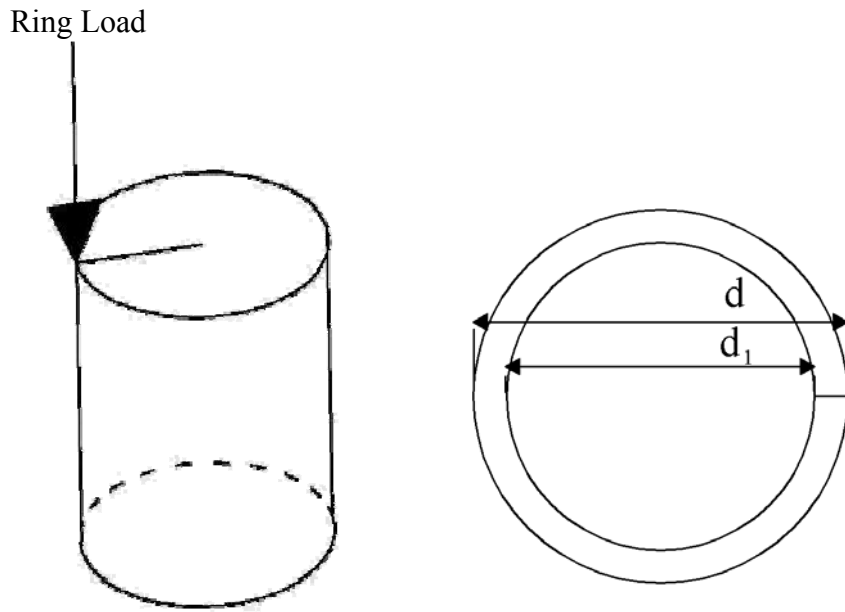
The “Ring Load” (a) and Pile Cross section (b)
